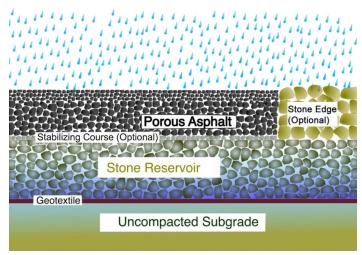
Cross section of typical porous asphalt pavement with stone reservoir (Image courtesy of FHWA)
